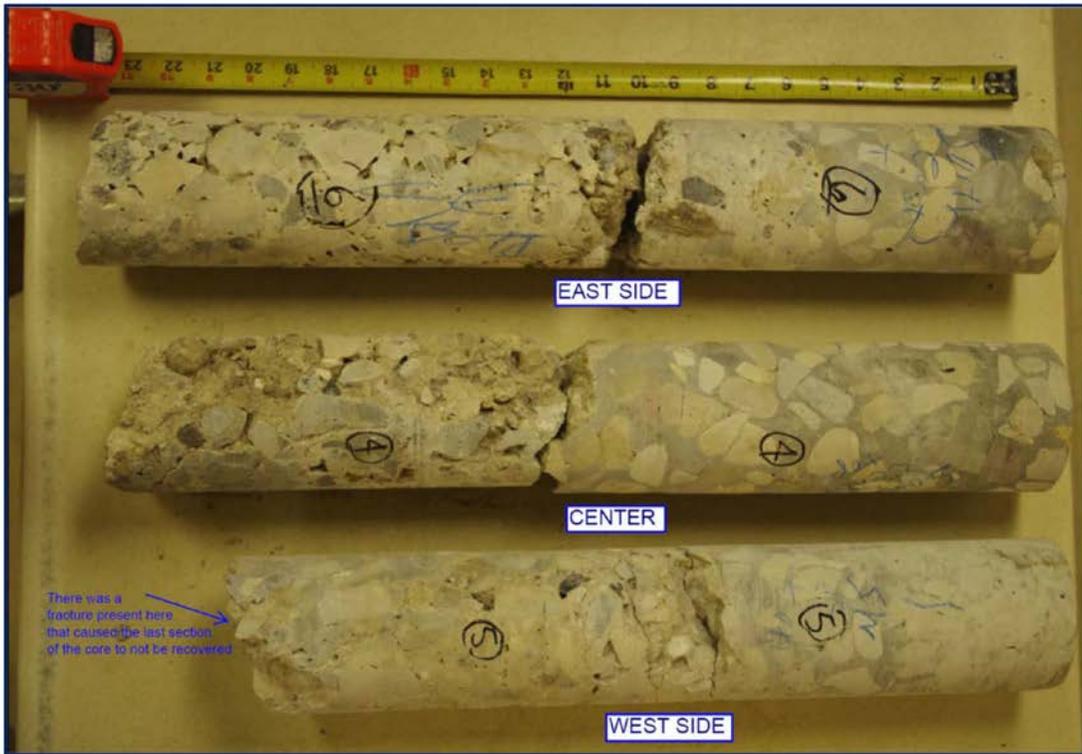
CONCRETE CORE PHOTOGRAPHS
